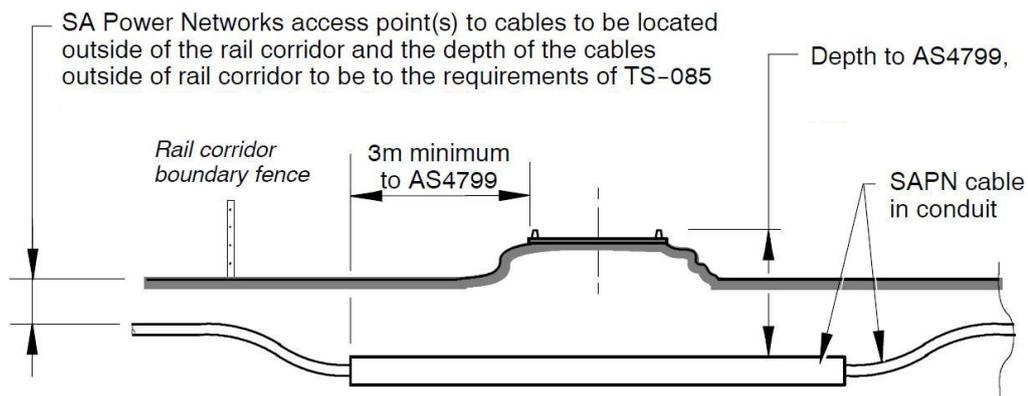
Conduit Extension (Crossing) under the Railway/Tramline
